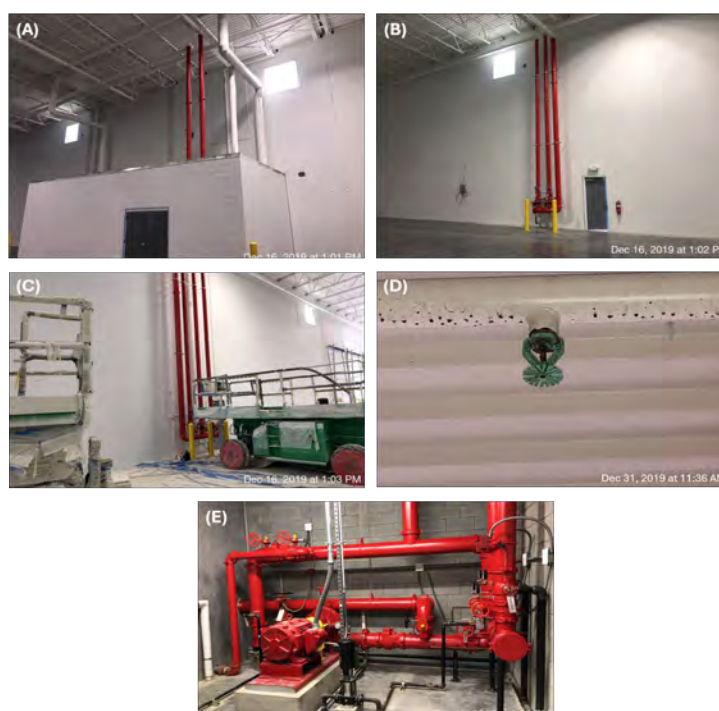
ESFR sprinkler system installed in the Plant 12 Storage Warehouse, including (A-C) piping in different locations, (D) a corroded brass-sprinkler head, and (E) the fire pump. (Credit: ARCO, annotated by CSB)
